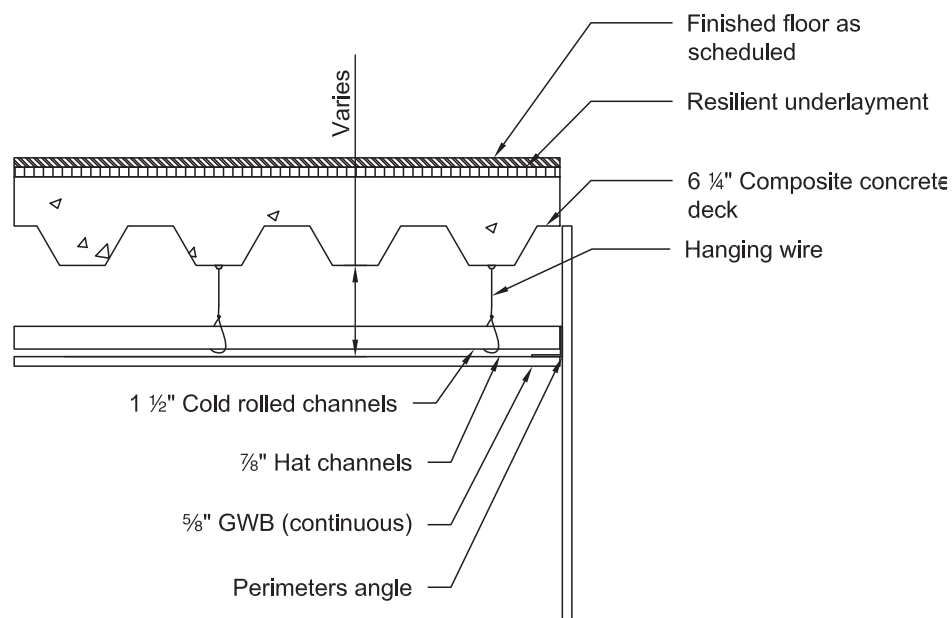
Composite metal/concrete deck with wire-hung ceiling and floors on a resilient underlayment.
